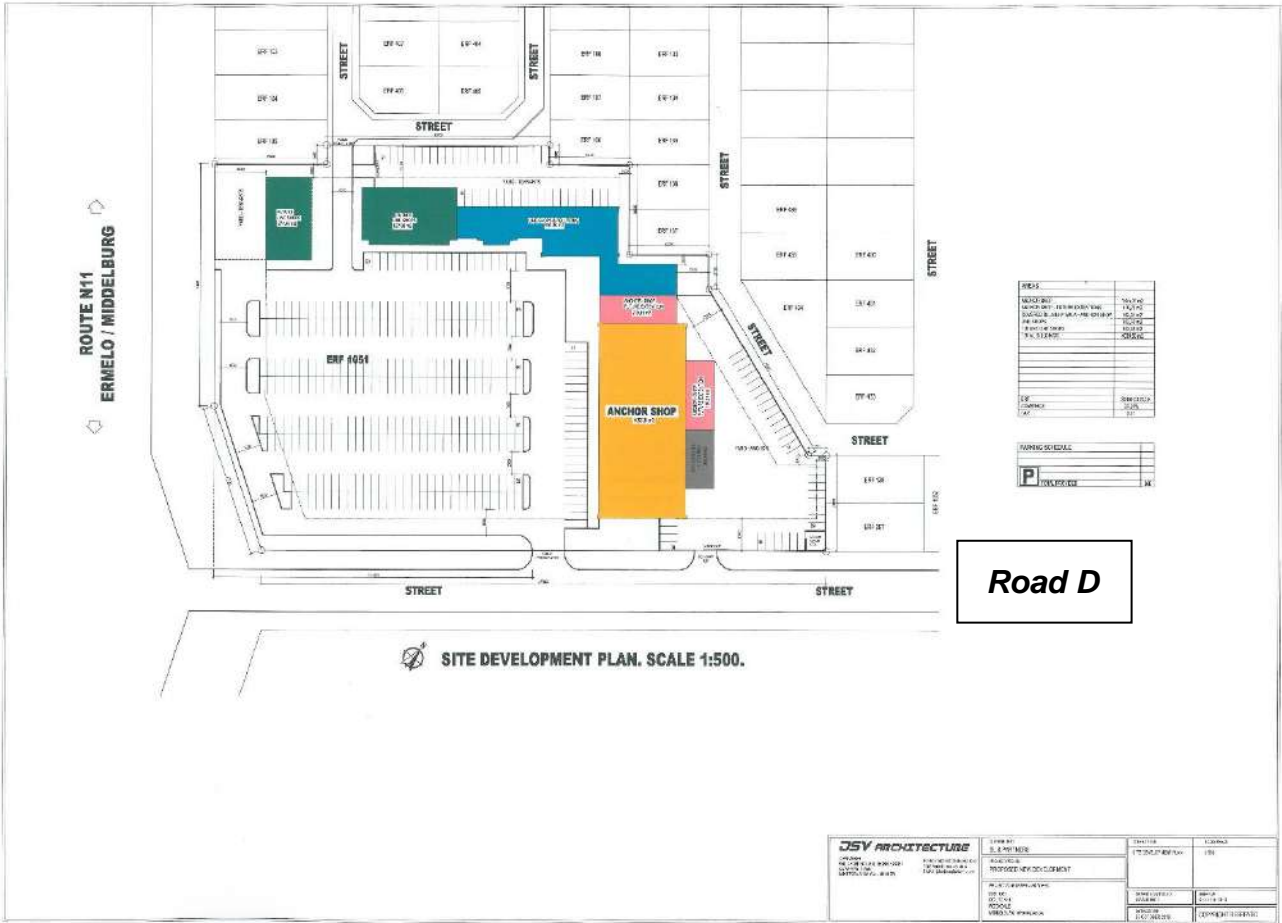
Proposed Erf 1051 Rockdale shopping centre
